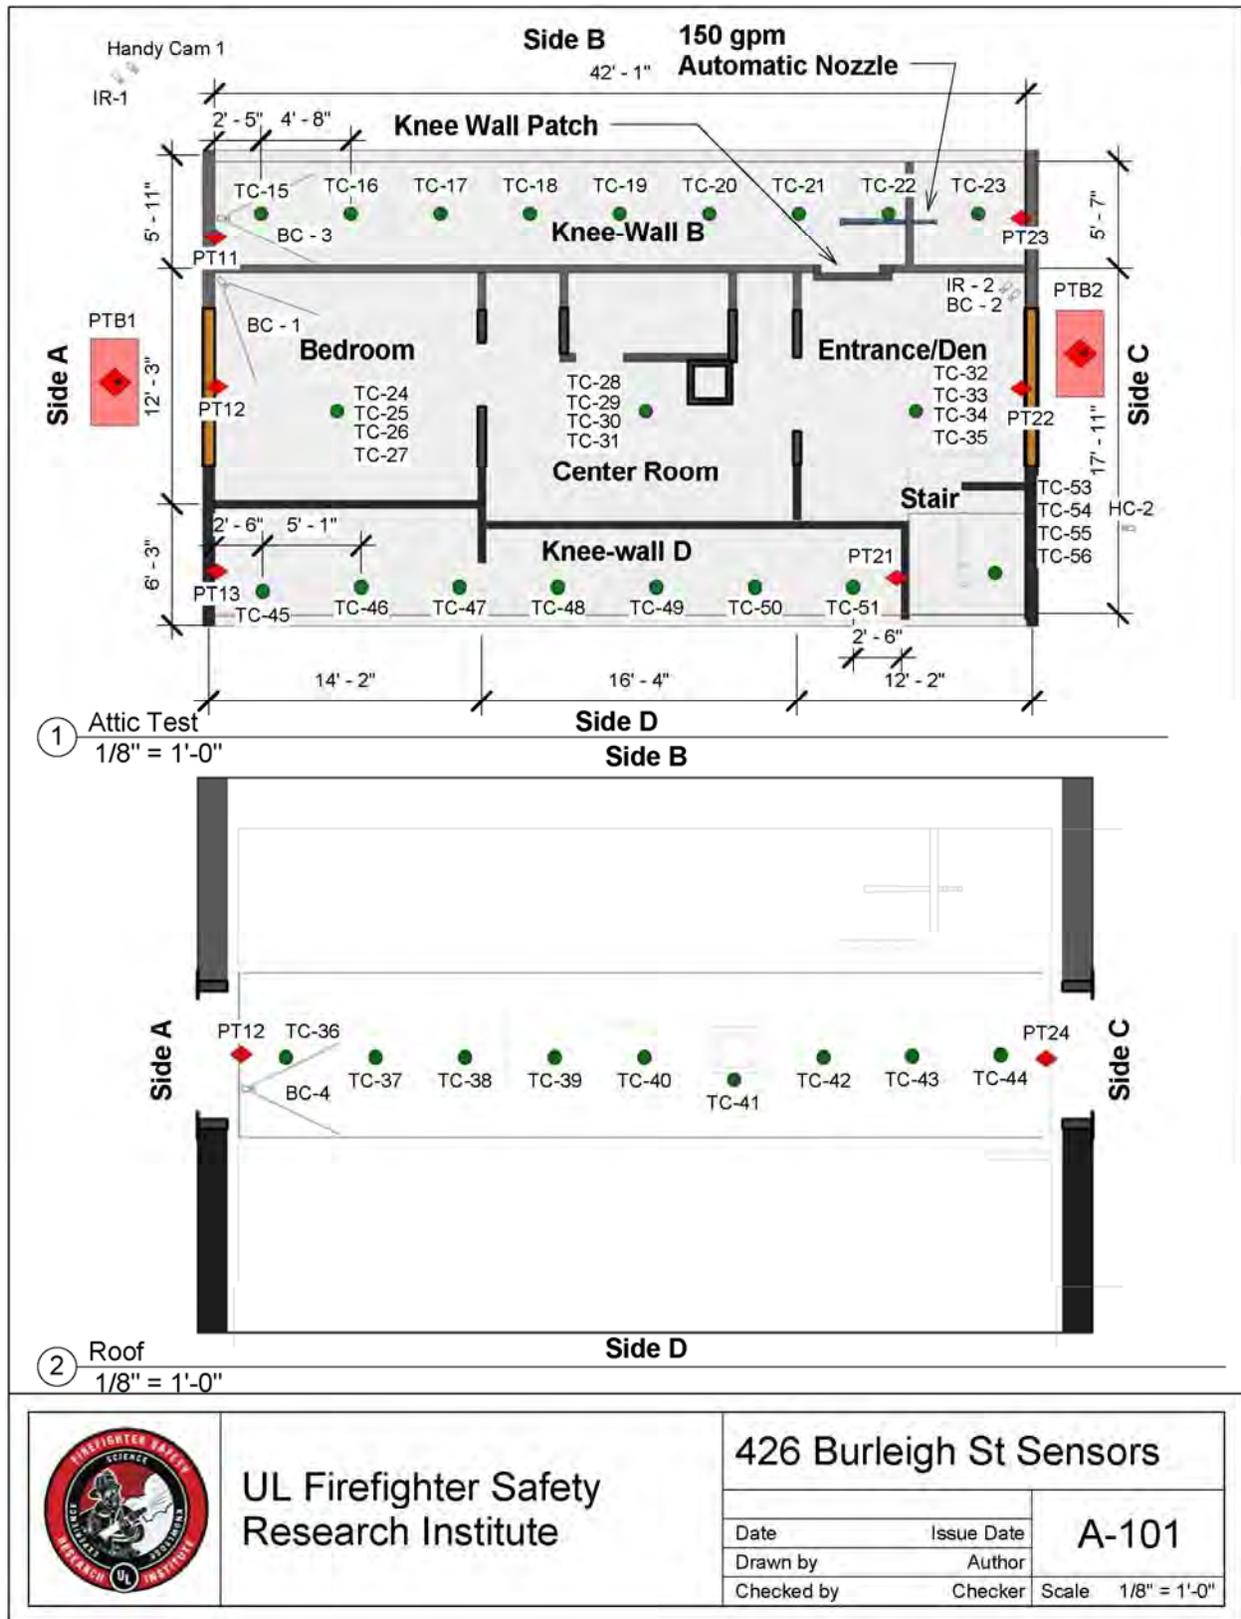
Field Experiment 2 - 426 Burleigh Street Sensors Attic Plan
